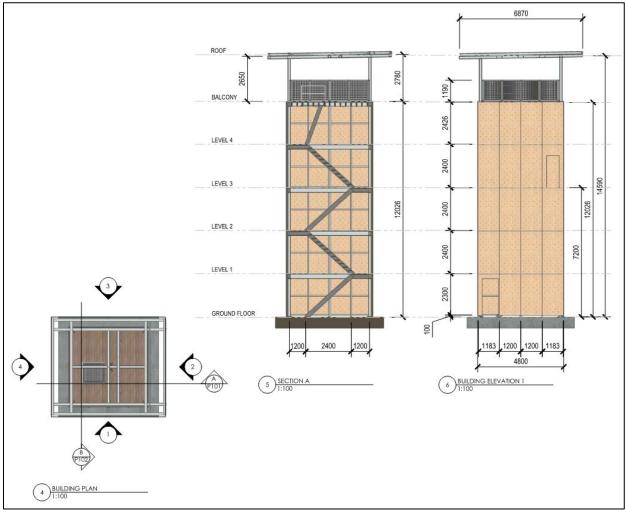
Proposed Activities Tower Elevation (Source: The Highgate Group, 2023)
